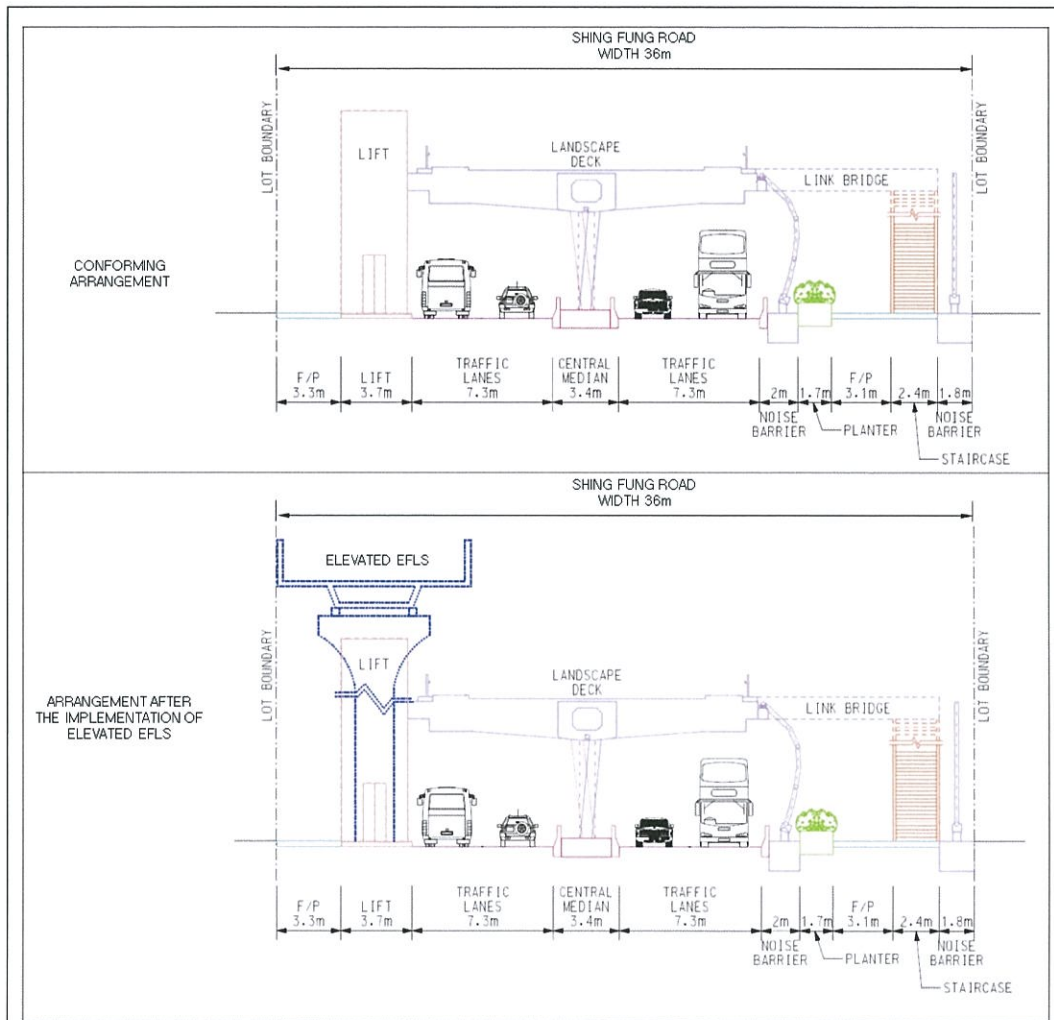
Typical Cross Section Plan of Option 3 (Elevated Dedicated System) on Shing Fung Road (Before and After Implementation)
